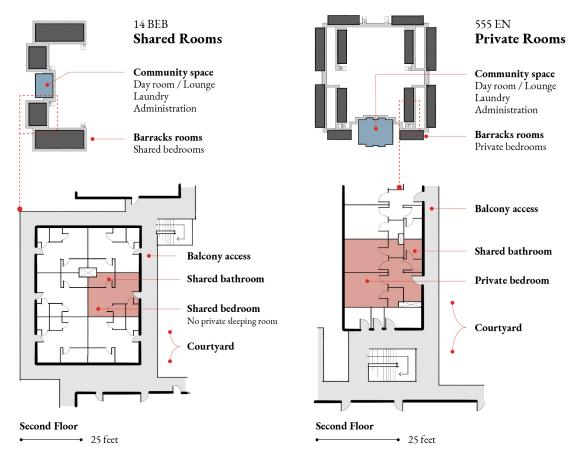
Floor plan comparison of 14 BEB and 555 EN barracks at Joint Base Lewis-McChord. Graphic created by the author.
